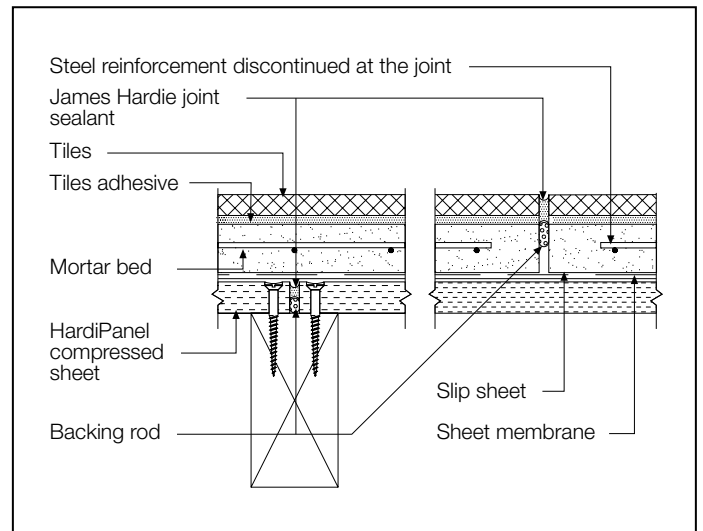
METHOD 1 - MOVEMENT JOINT DETAILS
